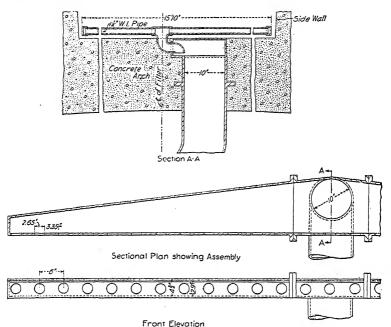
Details of special castings and pipe in underdrain system of Harrisburg, Pa., filter plant.
